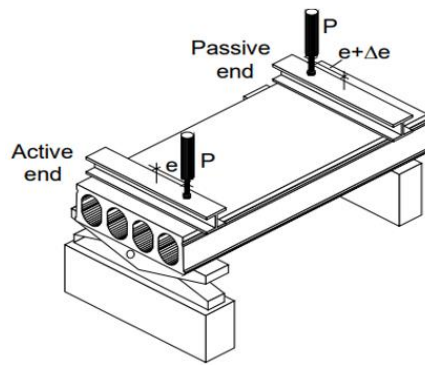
Torsion test setup for hollow concrete plank (Pajari 2004; Derkowski & Surma 2015)
